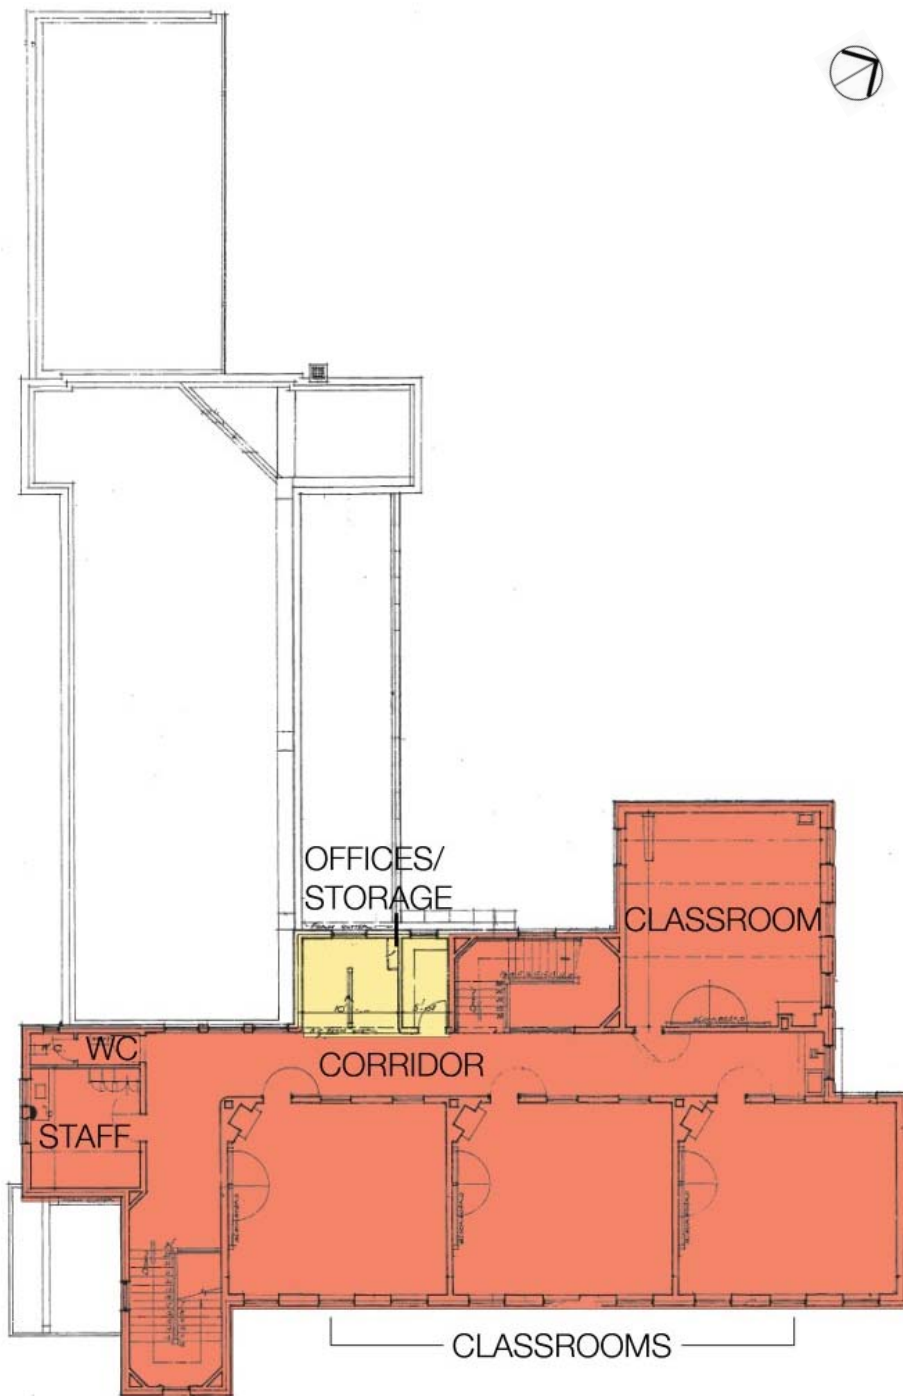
Significance of spaces in Fort Street Public School - First Floor
